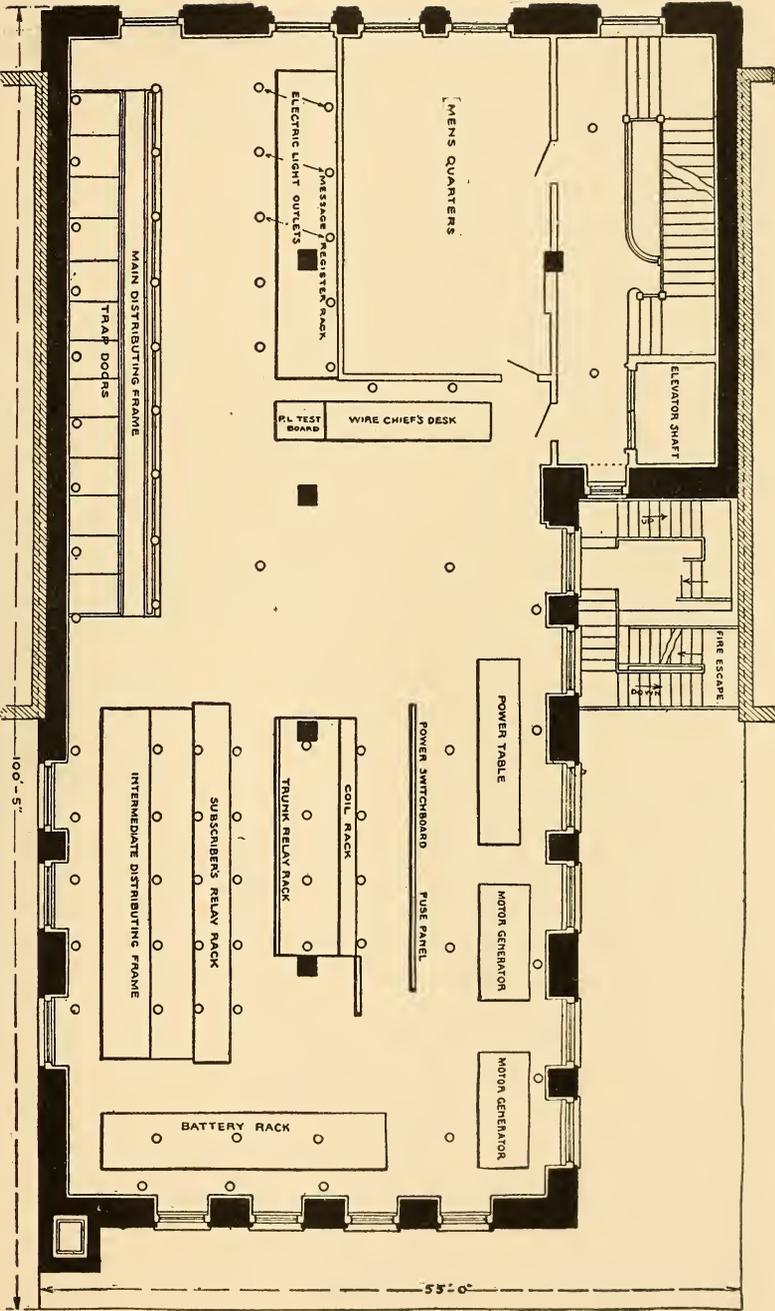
PLAN OF SECOND FLOOR—PLAZA OFFICE.
